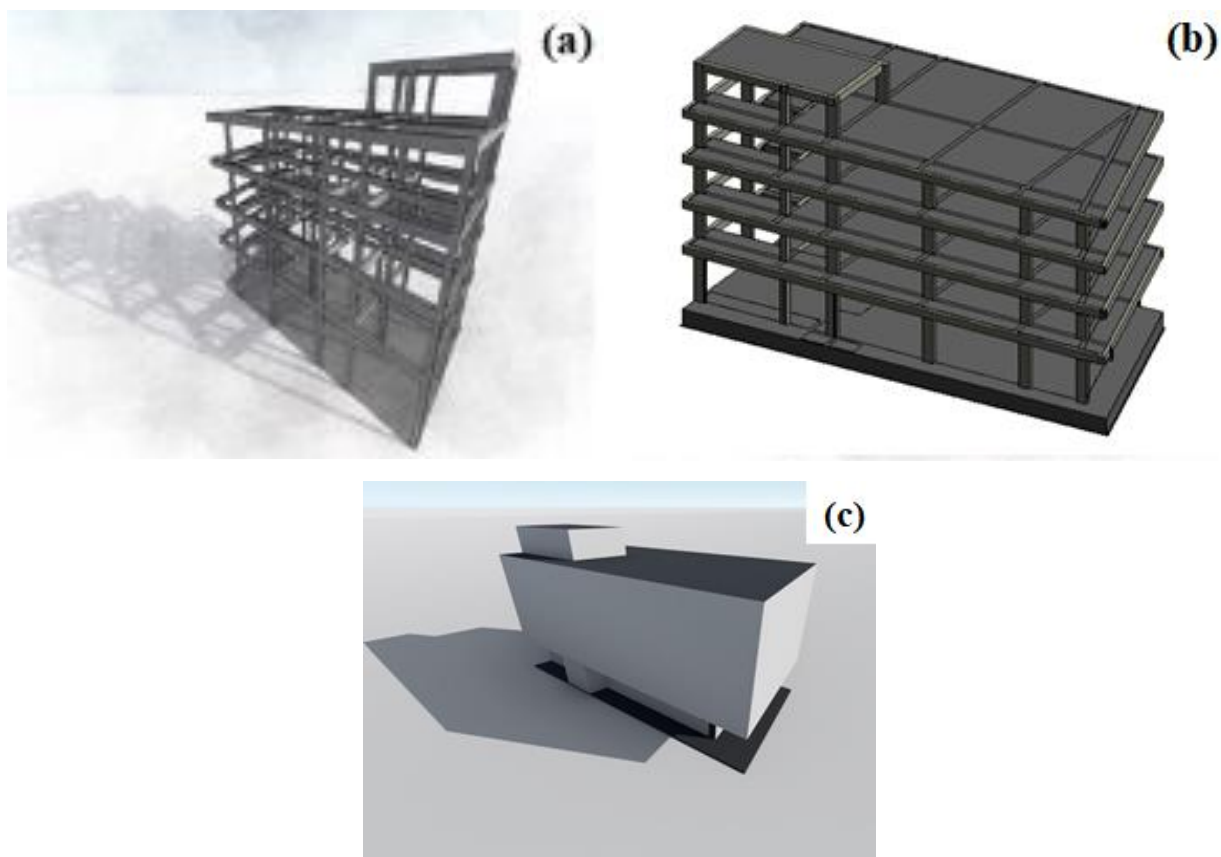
The commercial complex in Al-Ramadi, Iraq: (a) the raft foundation, columns, and beams, (b) the building after adding the solid slabs, and (c) the outside view of the building with concrete.
